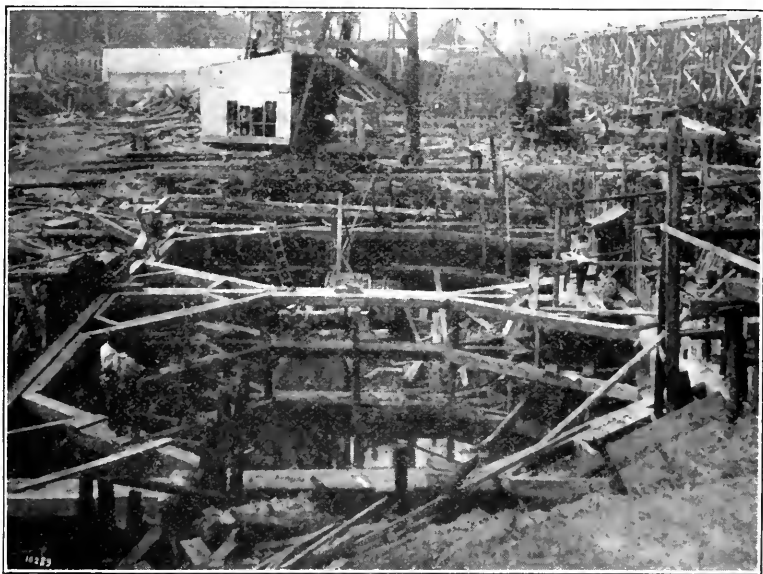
Bracing for Power House Excavation Rearranged for Setting Draft Tube Forms, Units 6 and 7.
